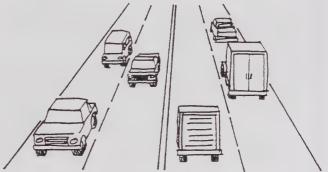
TYPICAL ROADWAY CROSS SECTIONS
